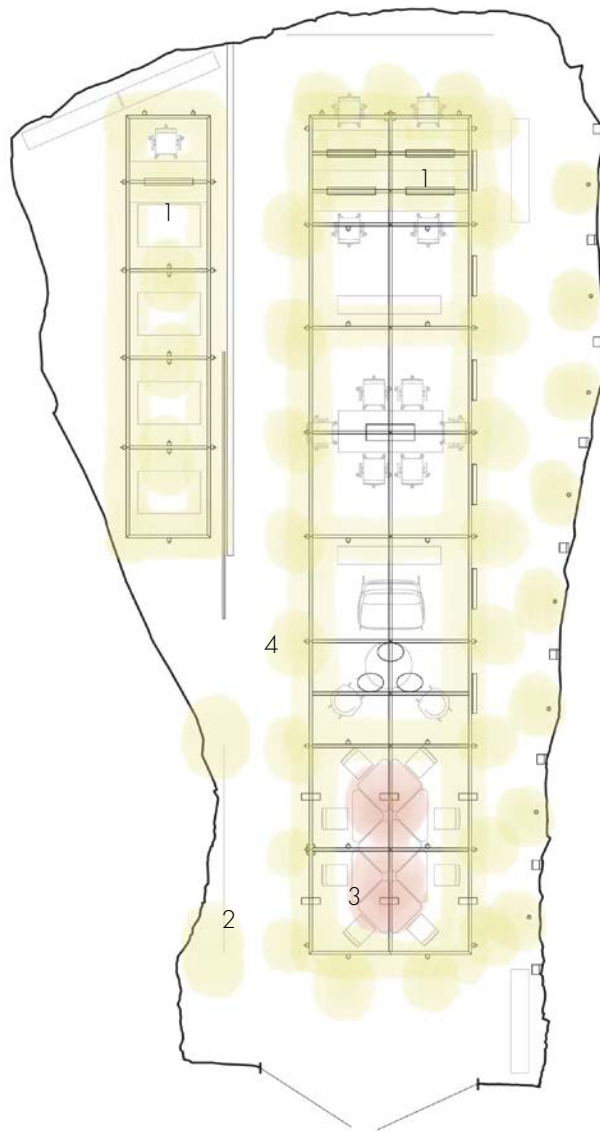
Sketch of lighting plan for scenario 2 in Lab 2
